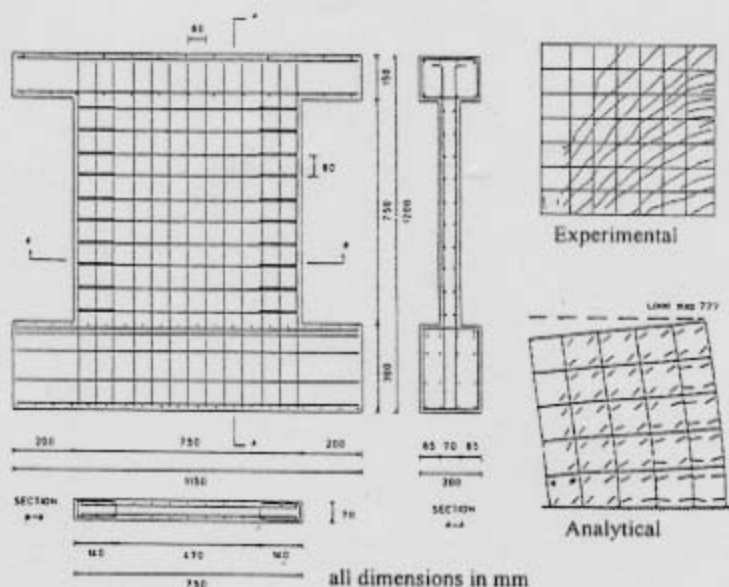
Case study 6. Dimensions and reinforcement detailing, and crack patterns at failure (after Gonzalez Vidosa et al., 1991c)
